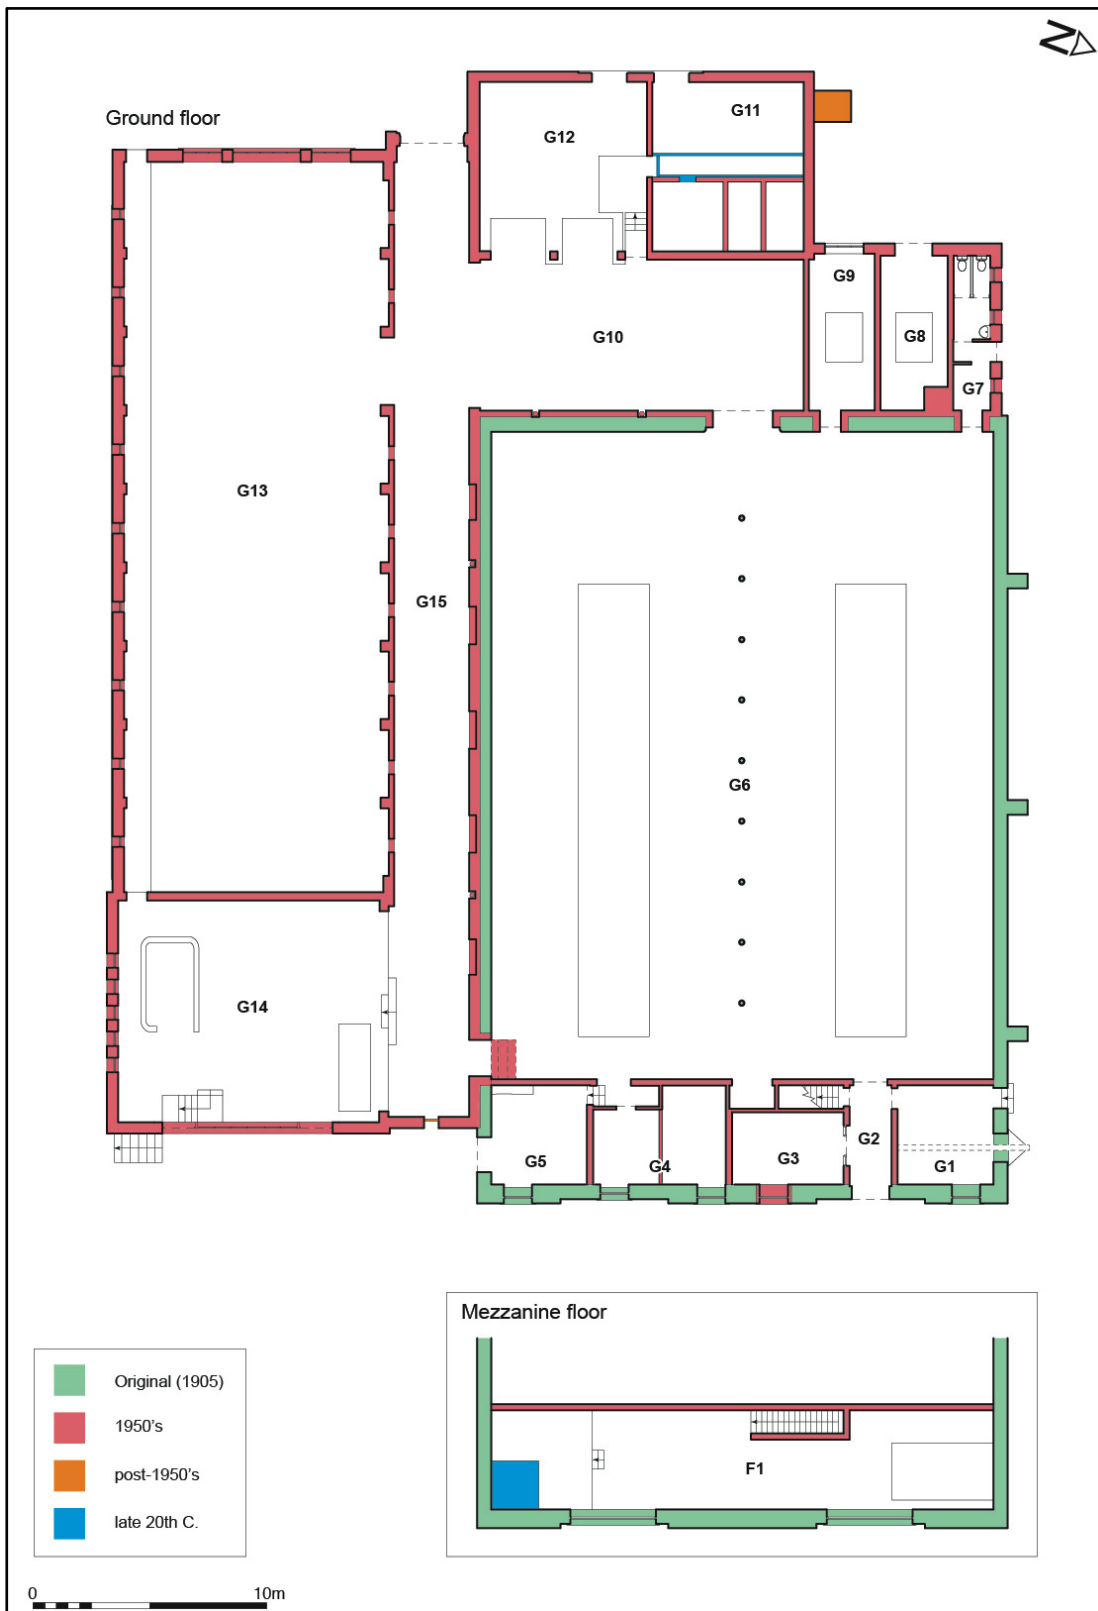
Floor plan of Filtration Building with archaeological phasing.
